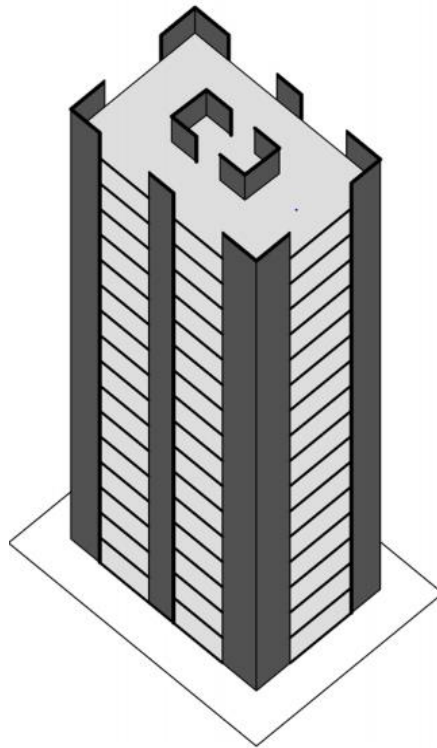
Shear wall system (Gunel and Ilgin, 2014)
